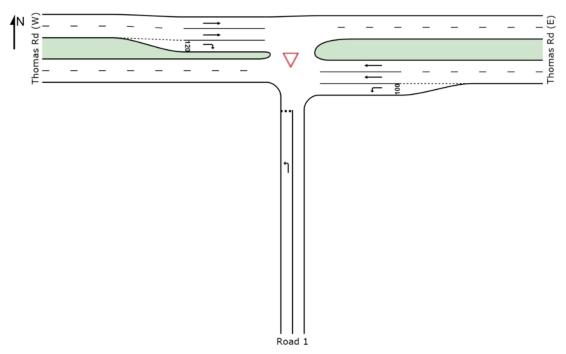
Proposed Thomas Road/ Road 1 intersection layout
